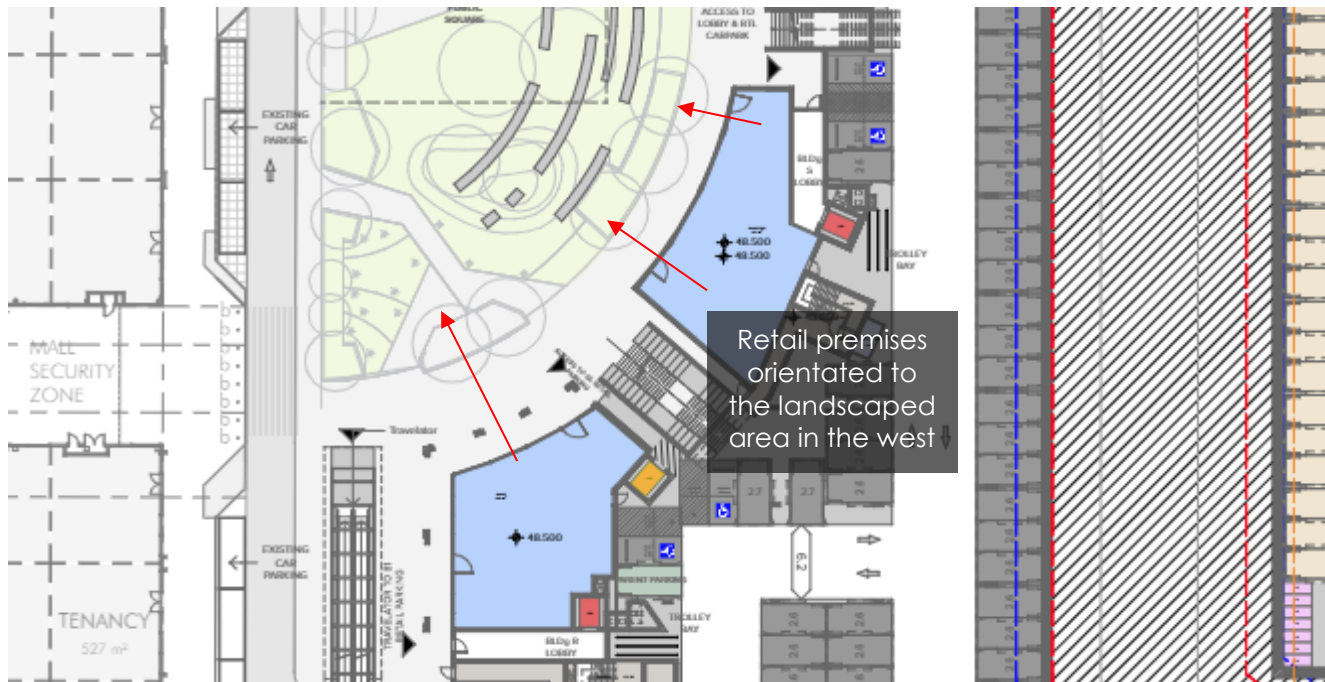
Extract from GA Plan [RL 48.00] (Source: Turner, 2024)
